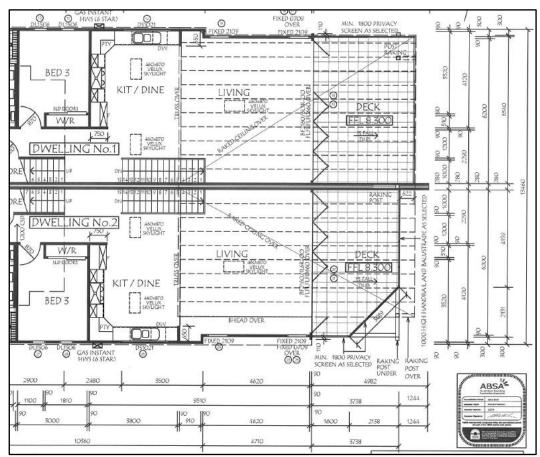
Extract from amended ground floor plan showing splay corner removed from deck to maintain views for 10 Admiralty Crescent.
